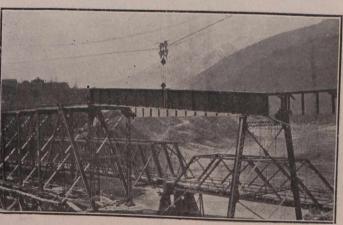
Falsework for Erection of 250-Foot Span. Plate Girder Span Being Placed by Cableway.
